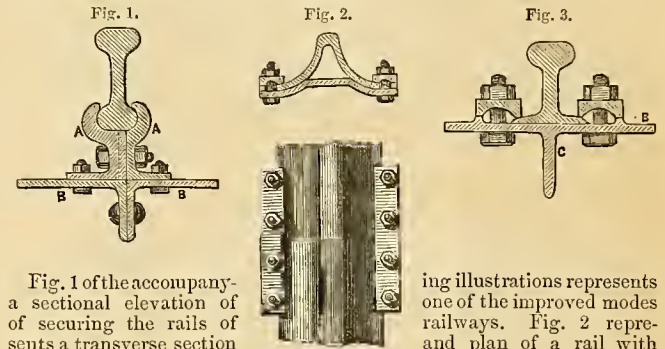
of the accompanying sectional elevation of securing the rails of a transverse section base plate. Fig. 3 is a
